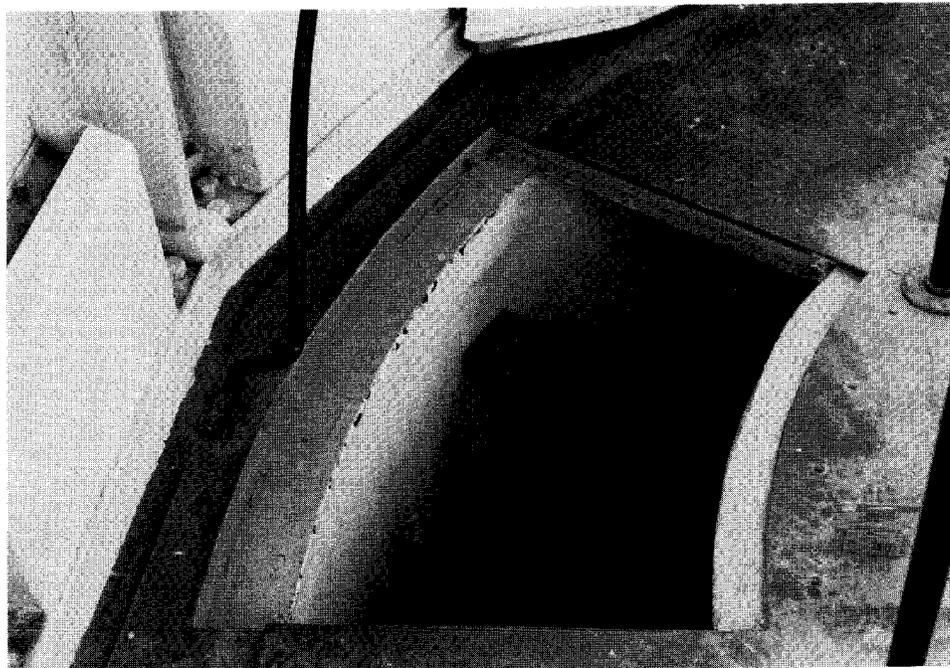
Room 112, opening at west side of Lantern Deck floor for stair down to Watch Deck.
